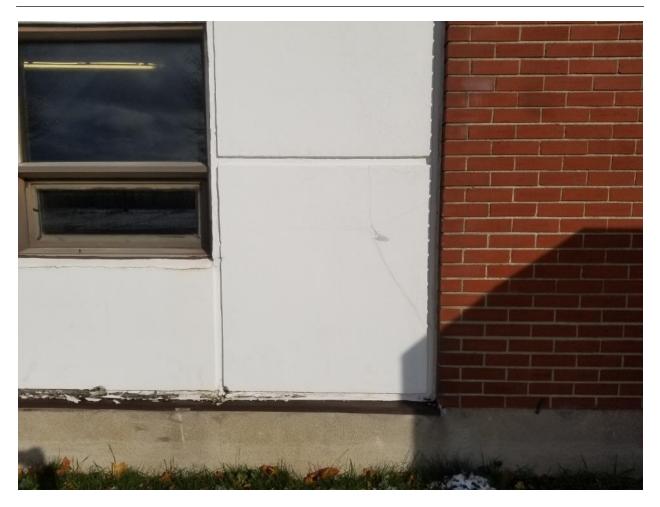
Exterior, south façade, east of first window, 1 square metre fair condition finish coat on wall.
